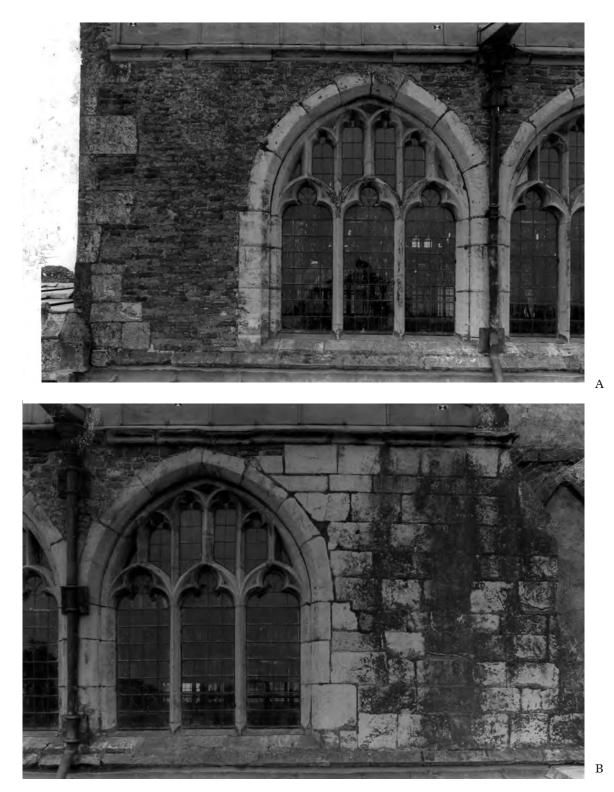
North clerestory. A, Bay 1 (east); B, Bay 9 (west); showing windows and adjoining nibs of brickwork and ashlar masonry, 1983. Photos: Warwick Rodwell
